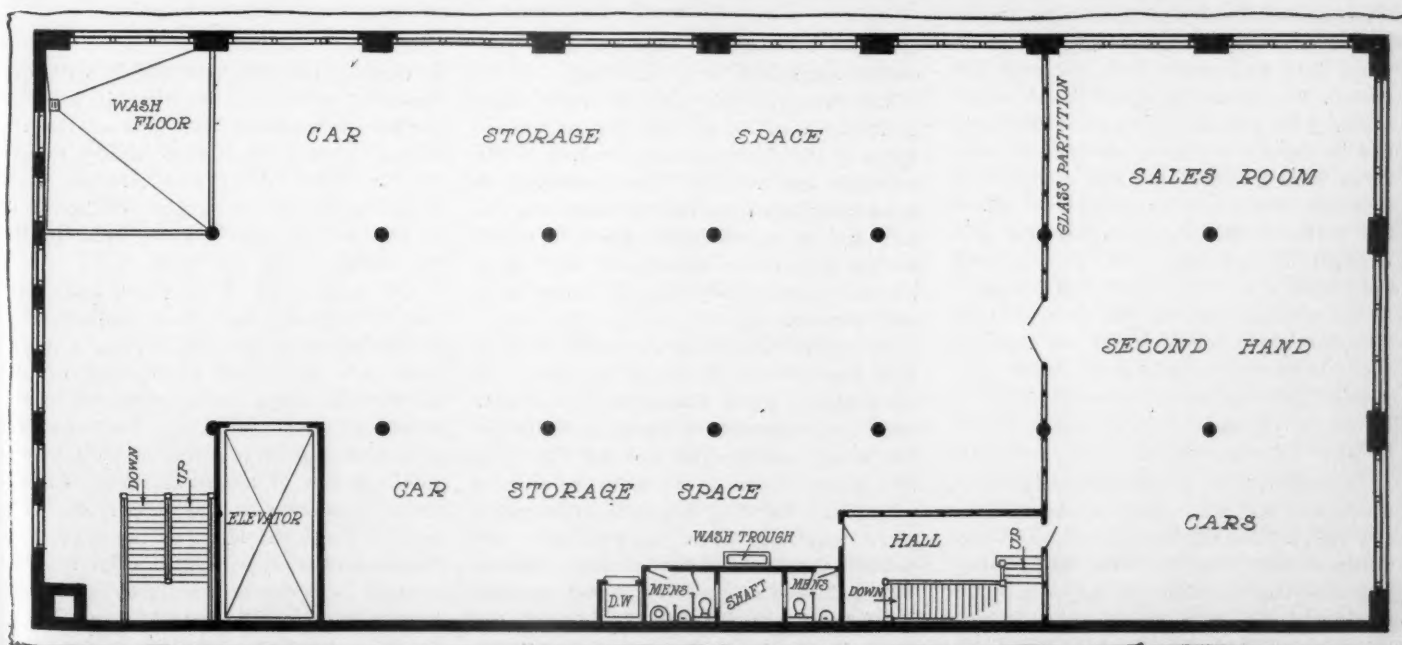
SECOND FLOOR PLAN OF NEW CHICAGO LOCOMOBILE BRANCH
